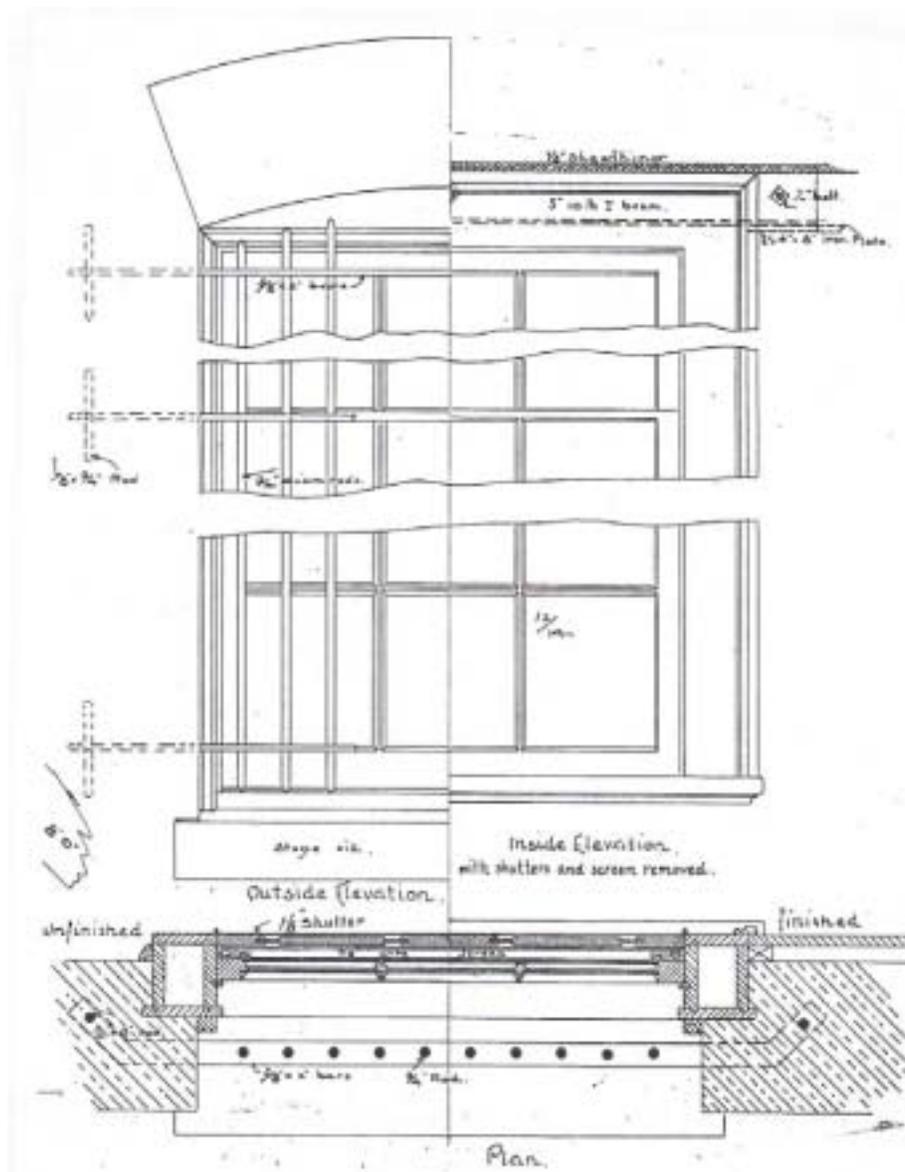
Elevation and plan of window, as designed in original 1894 drawings and constructed in 1898.
